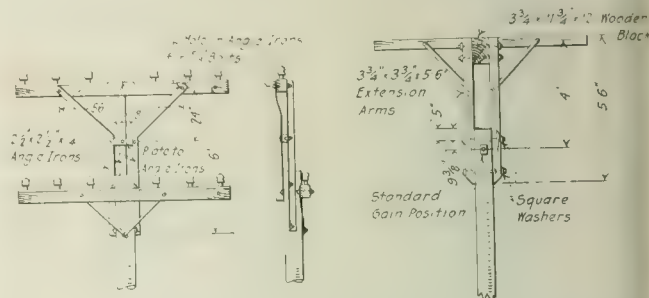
STANDARD STEEL AND WOODEN POLE-TOP EXTENSIONS
